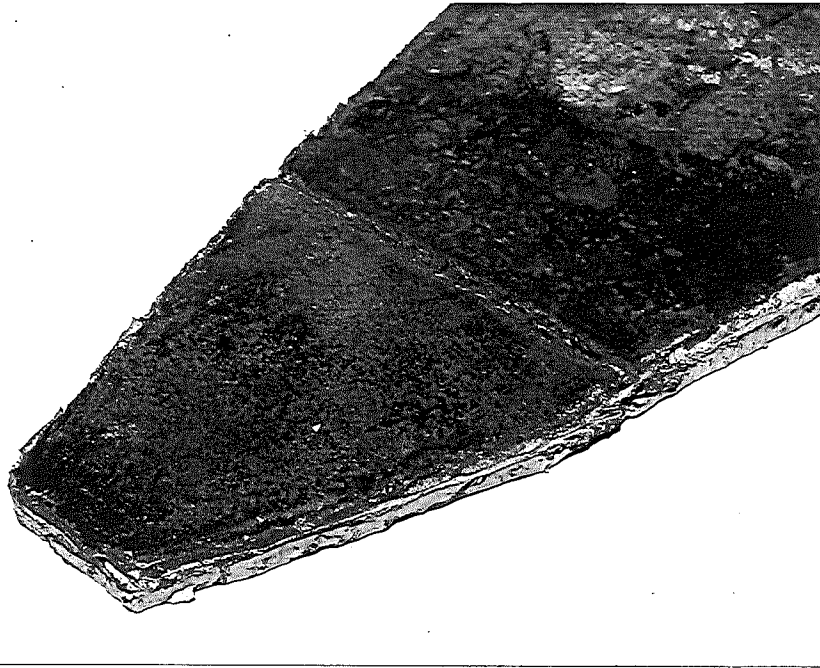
Tapered end section of cover plate, showing scrap welded on for proper outward appearance.
